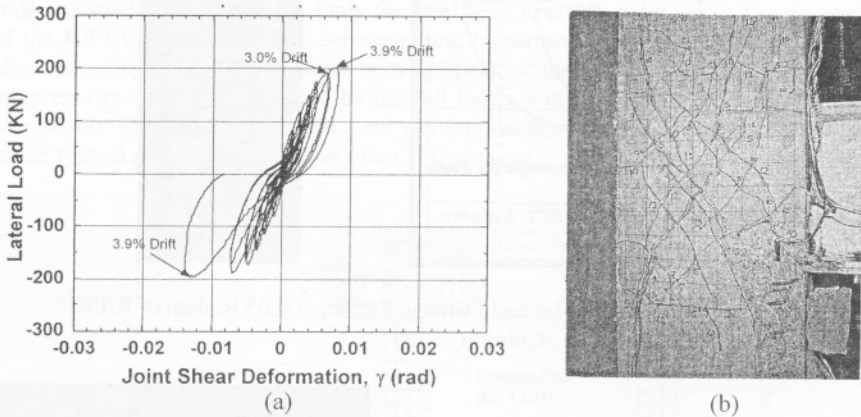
(a) Lateral Load –Joint Shear Deformation Plot, and (b) Failure Mode of R/C Joint
